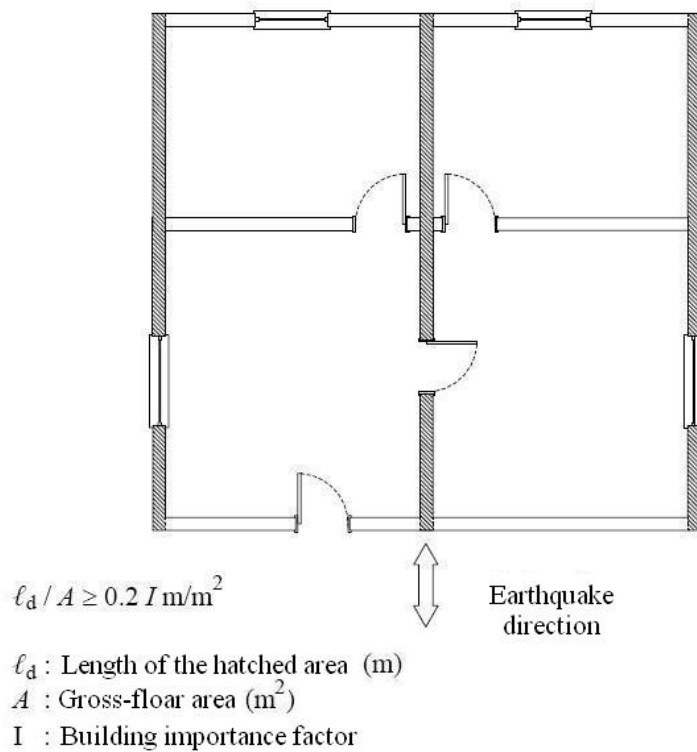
3 Length limitation of structural walls in masonry buildings.
